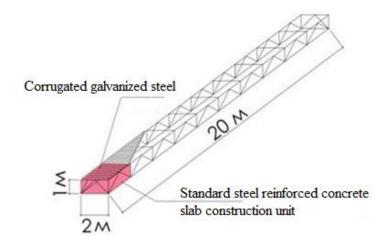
Steel part of a steel-reinforced concrete slab block for use in low-span bridge buildings
